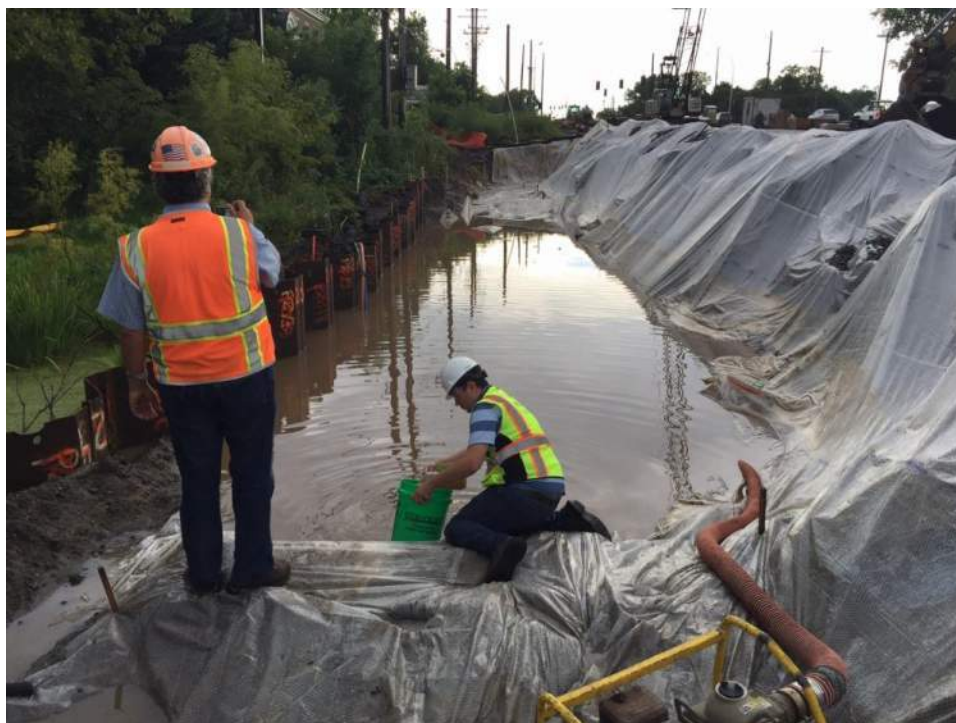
Field analyst collects a grab sample of construction stormwater runoff
